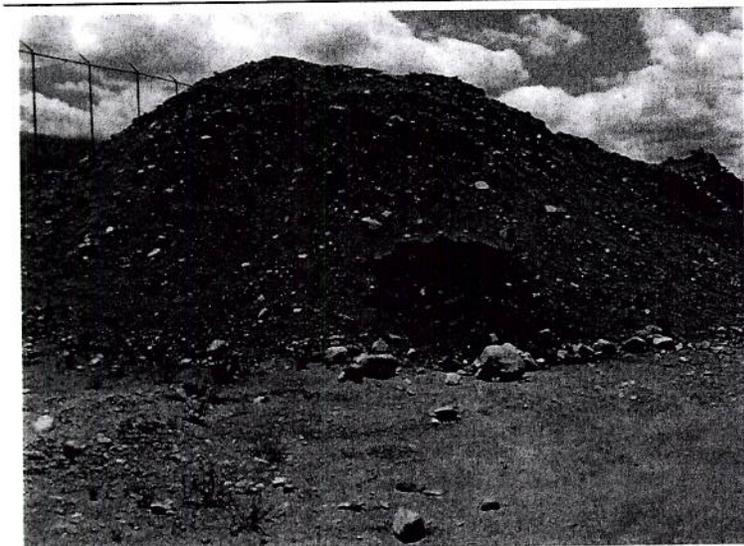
Soil stockpiles located along the south east portion of the construction area. The stormwater drains to the north and into the retention pond.
